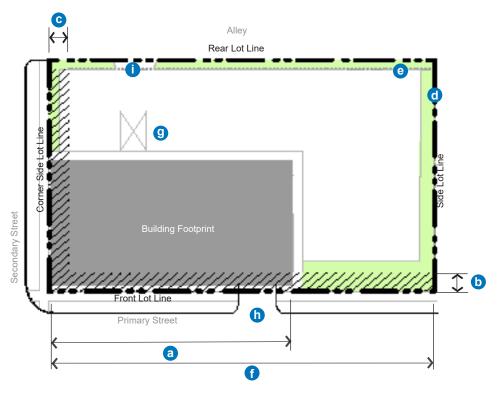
(G)(1). Limited Bay Building: Building Siting.
